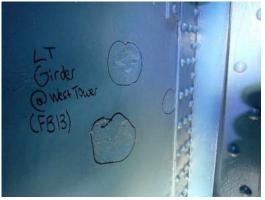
Pitting on north web of Left Girder east of FB13, looking southwest
